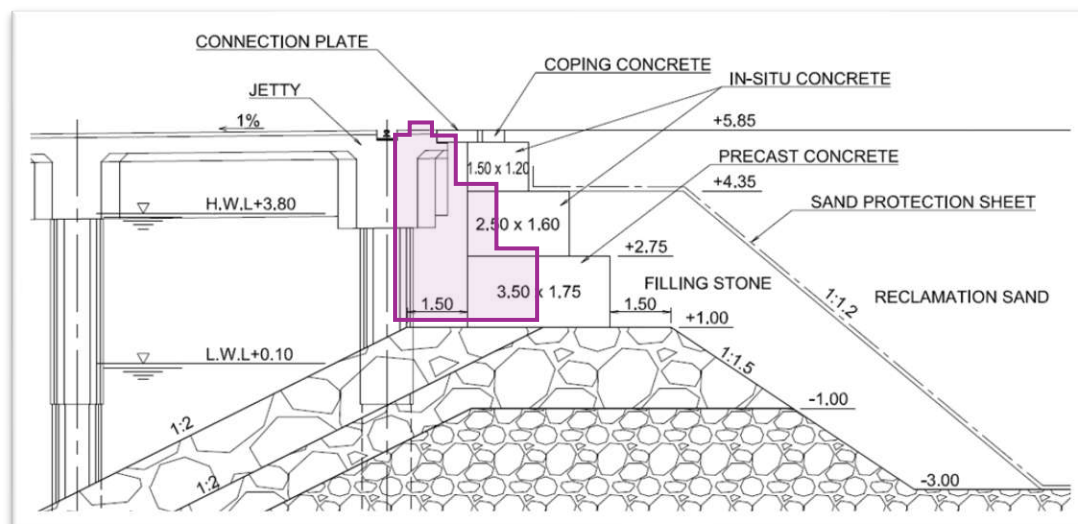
TYPICAL SECTION OF A RETAINING WALL
